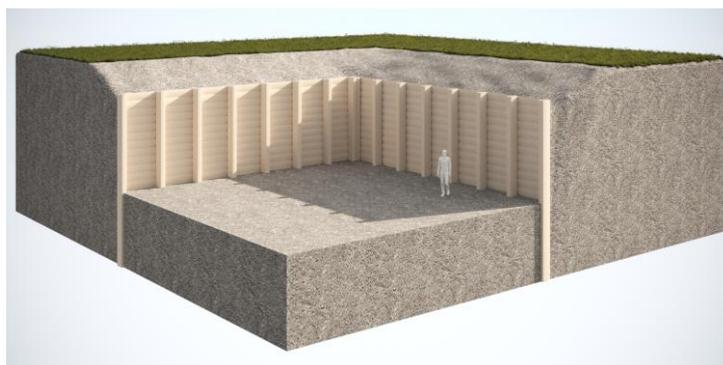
Proposal 6: Cantilever retaining wall: cantilever beams made of Vestas-type spar caps and plating made of fragments of LM blades (visualisation - N.Jakubiak, W.Jabłoński)
